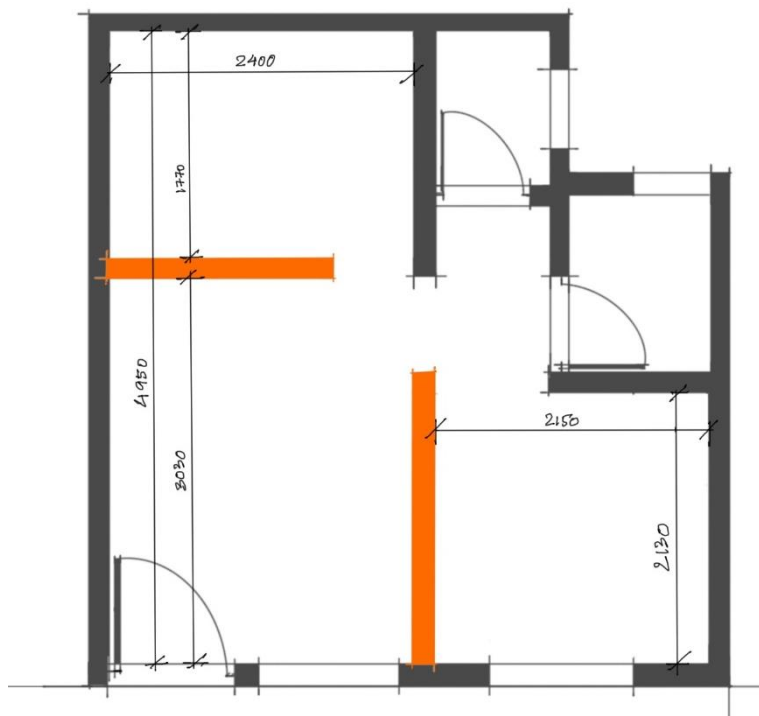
Structural walls (grey) and internal walls (orange); Source: Author
